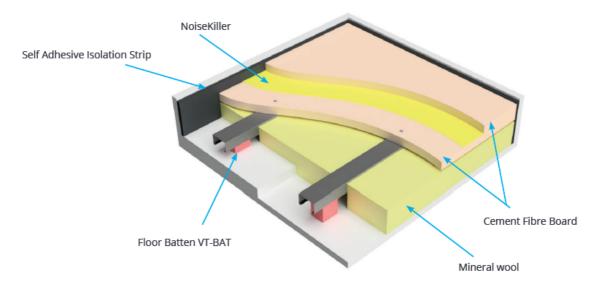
Illustration of a typical installation of the floor system VT-BAT.
